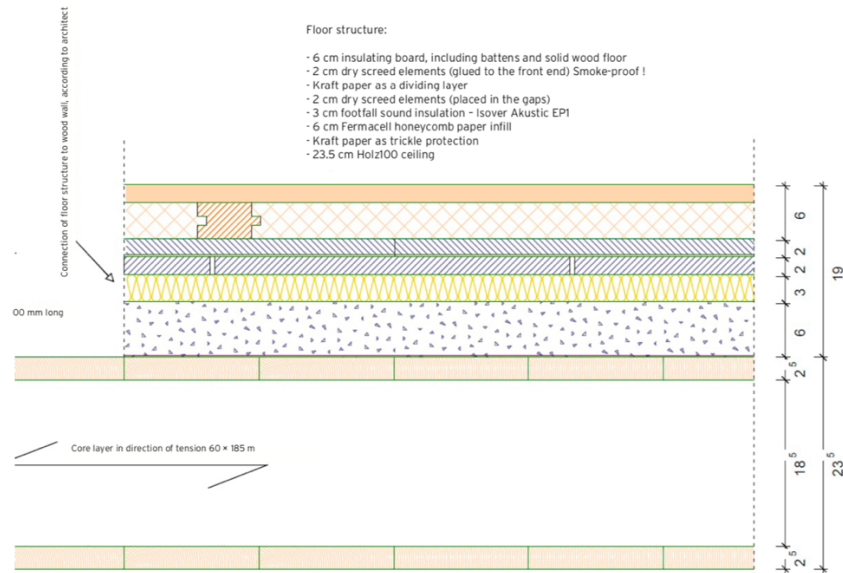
Floor cross section of the WOODCUBE (Petersen, Rödel, (2014). p.13)
